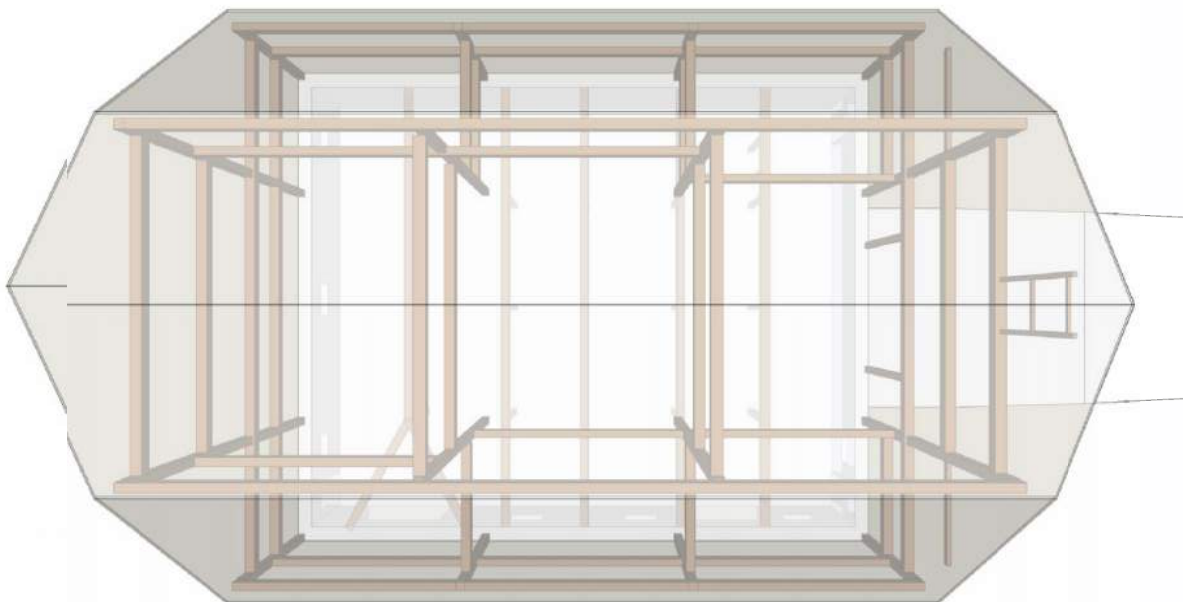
Conover Barn. Perspective Plan showing structural elements.
